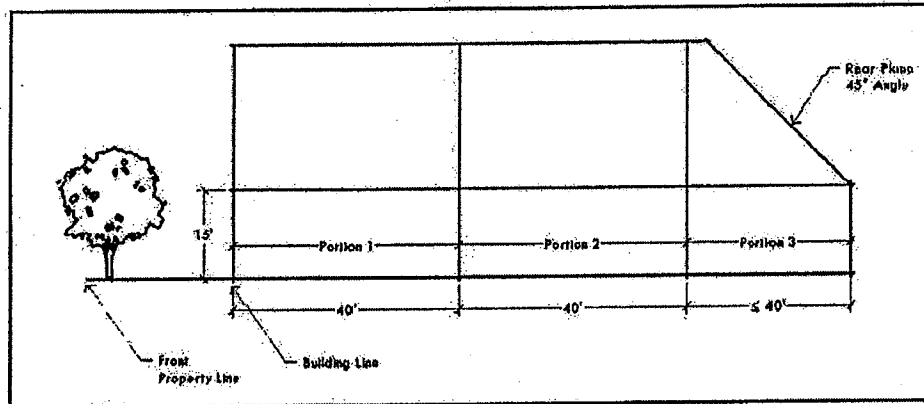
(Elevation View) Rear Setback Plane (Level Ground)
